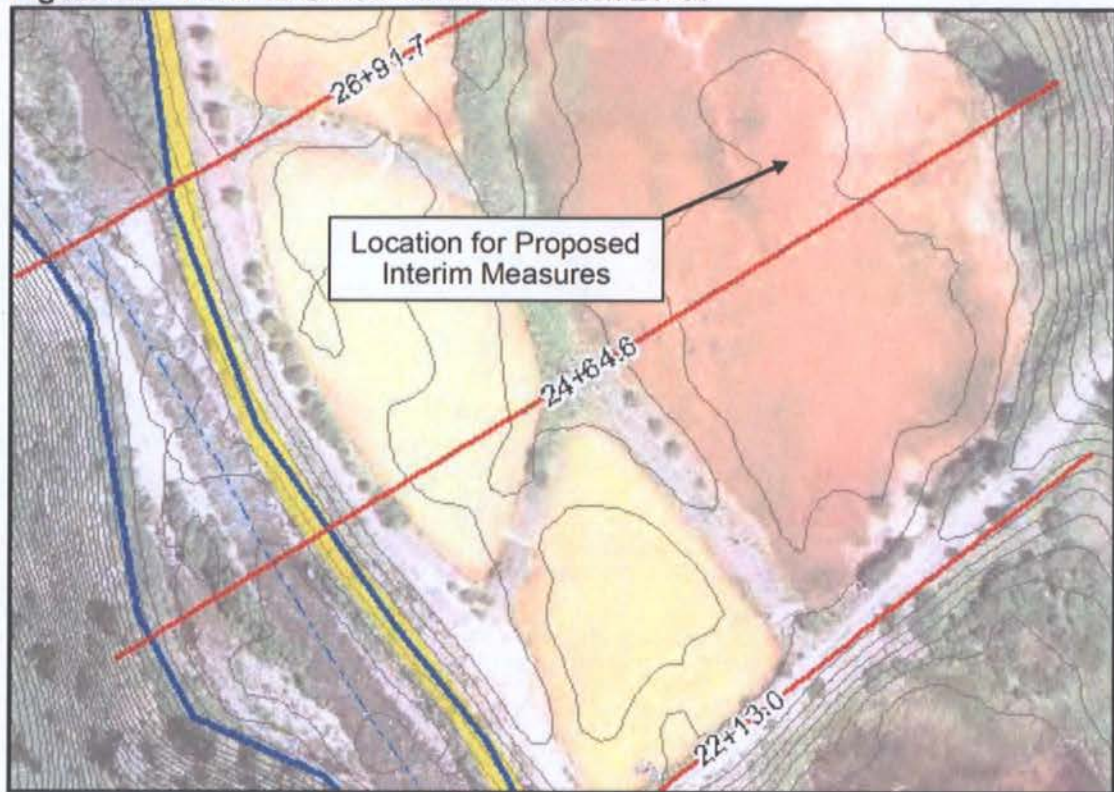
Pond 9 and 10 Critical section at station 20+45
